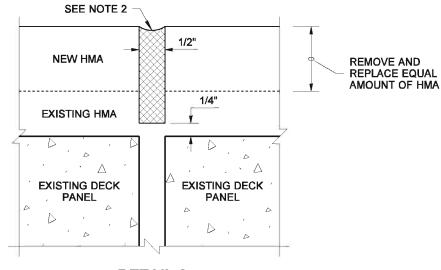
1" JOINT SEAL BRIDGE DECK WITH HMA OVERLAY
